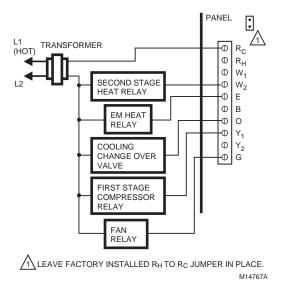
Single-stage heat pump with separate auxiliary and emergency heat wiring diagram.
